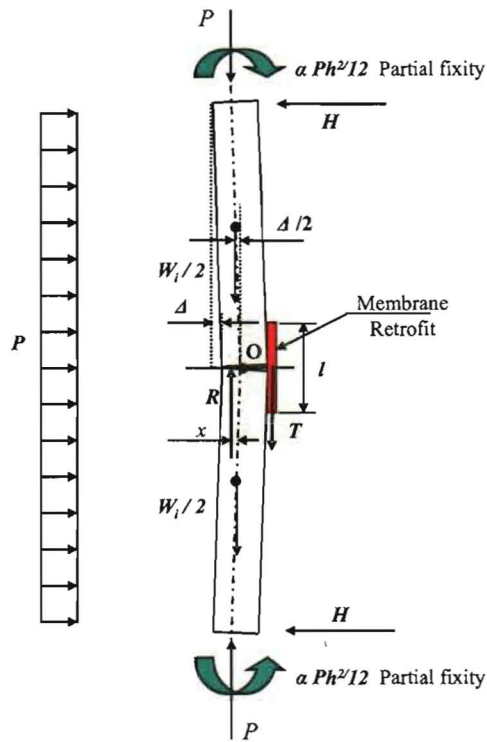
Free-body diagram of membrane retrofit concrete masonry wall
